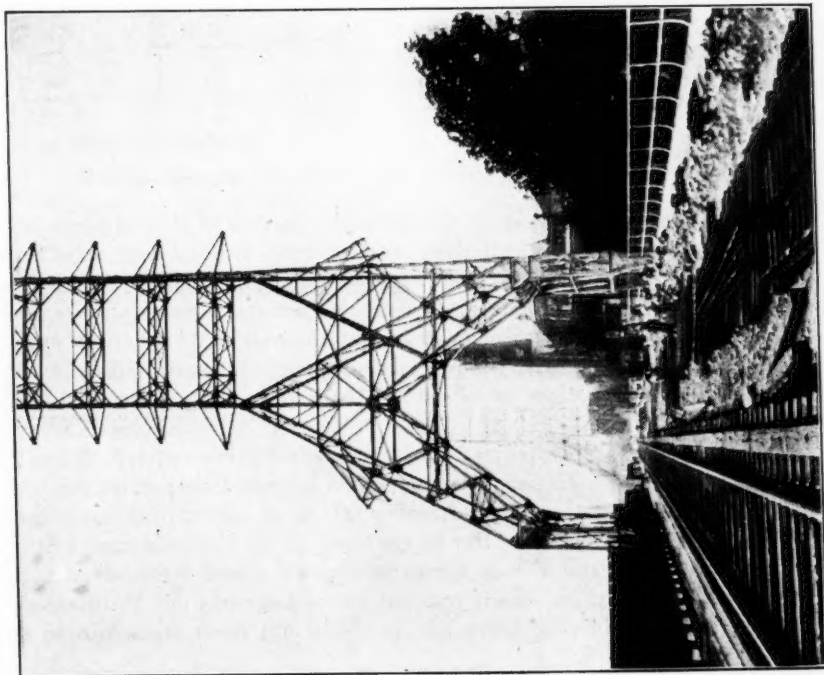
TYPE T BRIDGE STRUCTURE.
